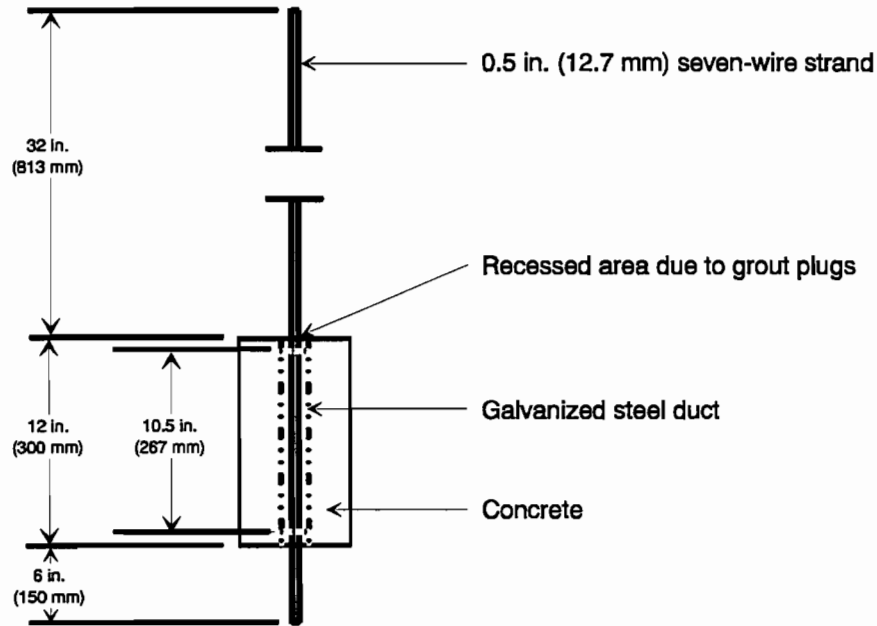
Pull-out specimen for small-scale pull-out tests.
